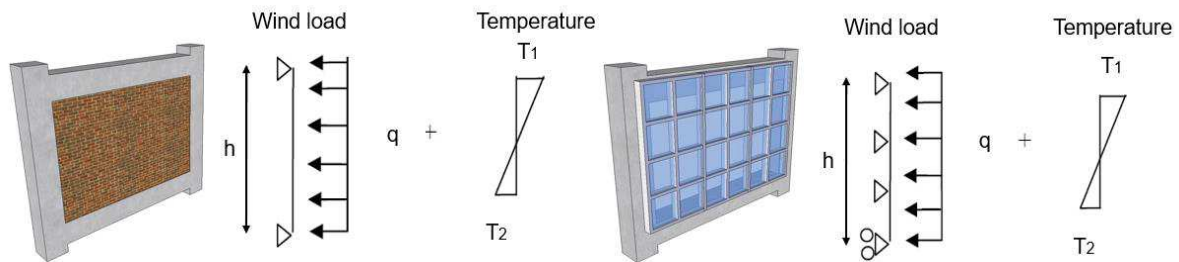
Example of static schemes for the infill wall façade system (left) and curtain wall solution (right).
